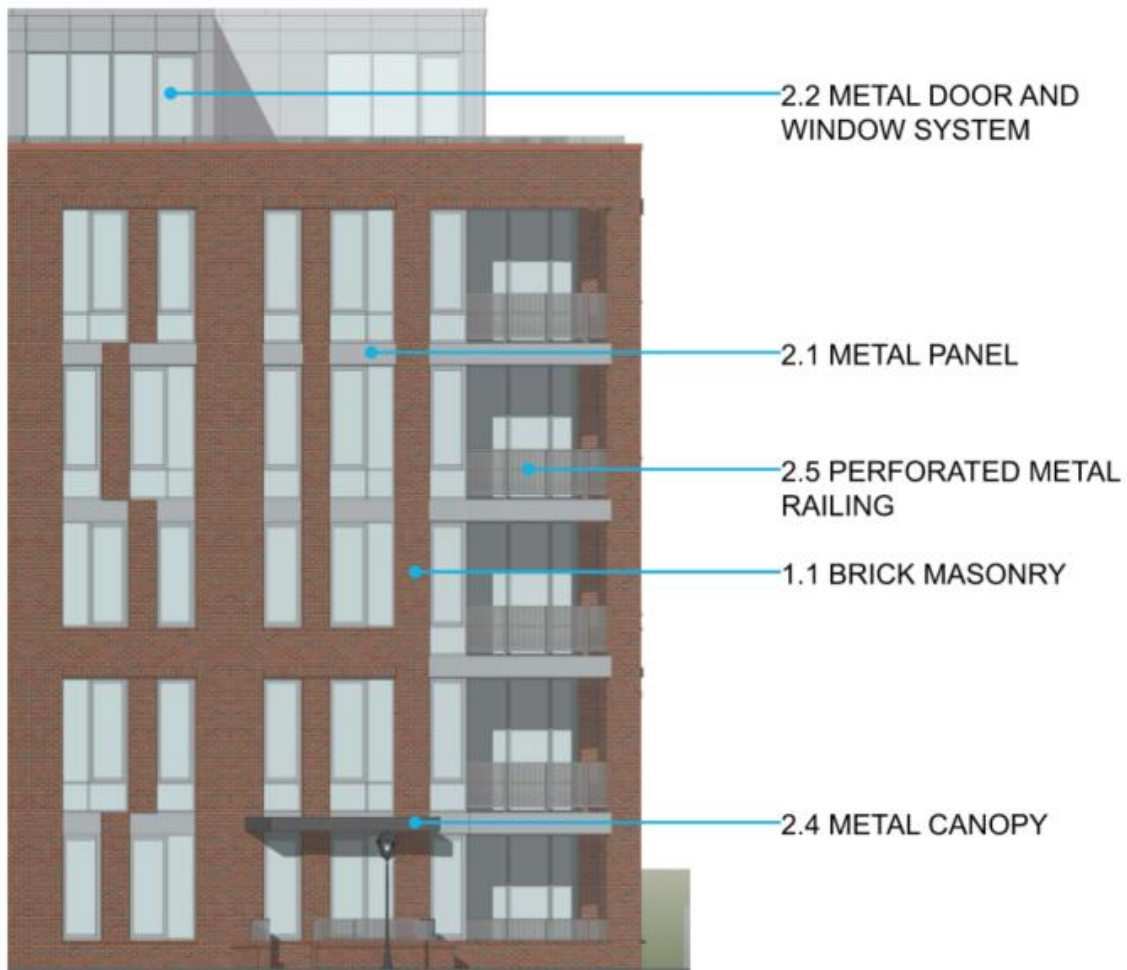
Enlarged elevation of addition showing offset brick piers at glazing bays
